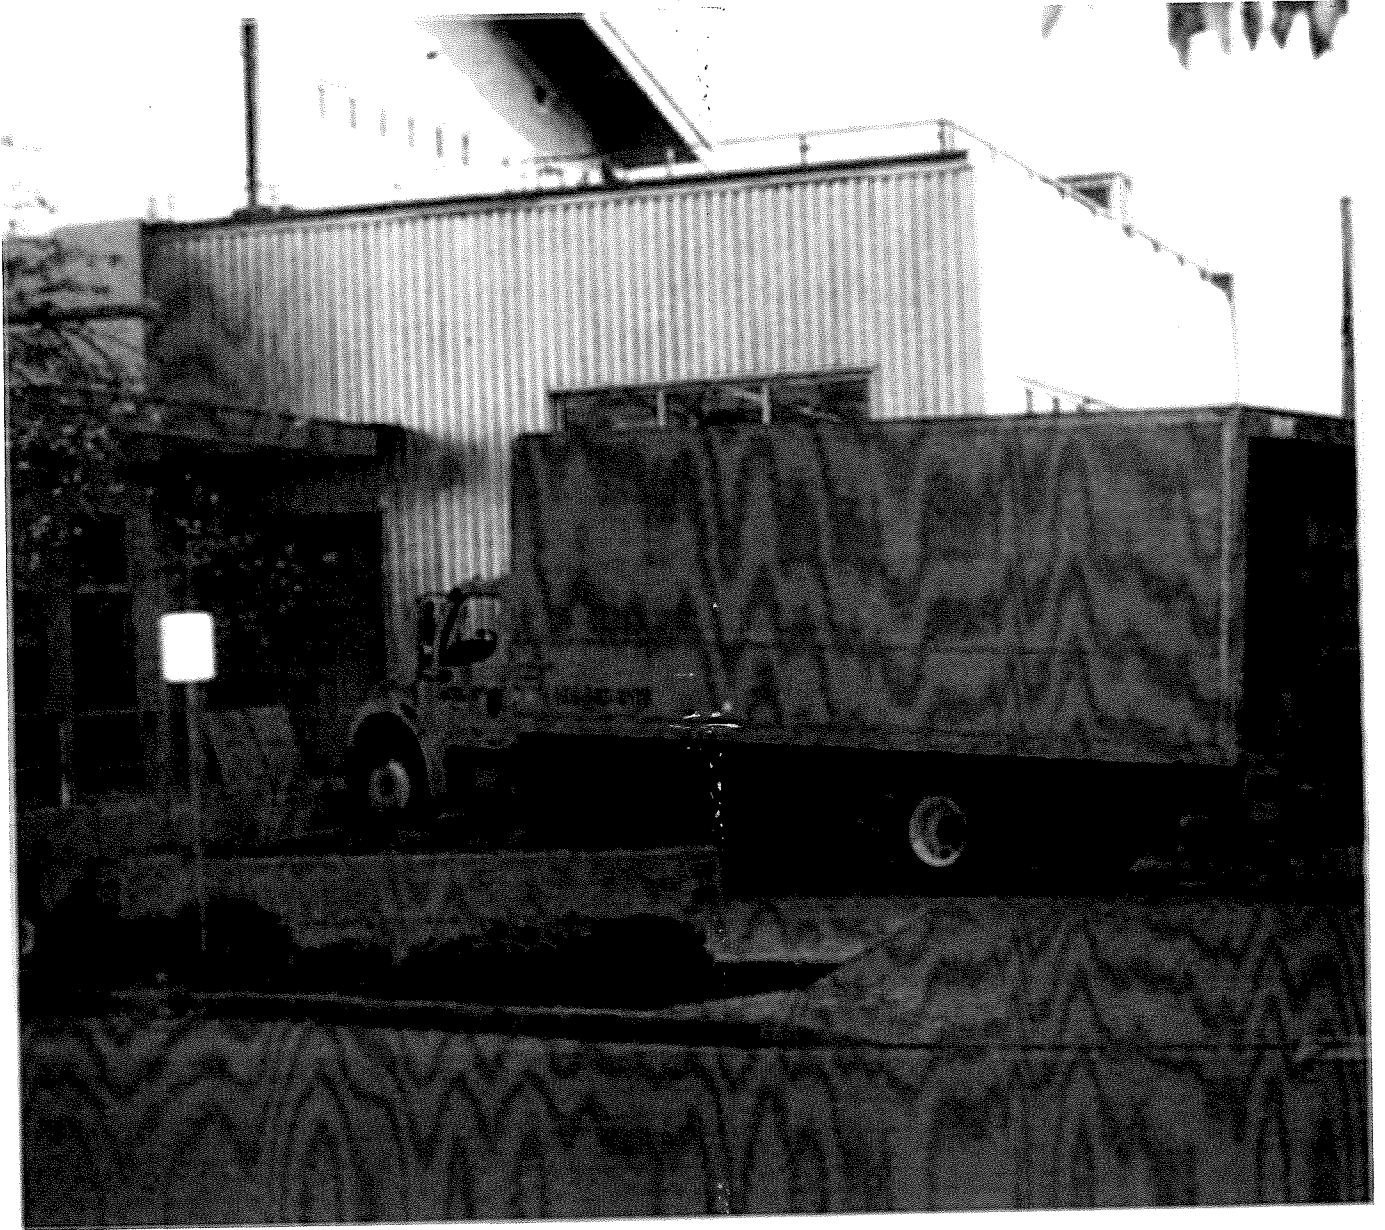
shows 4080 Bayview St where the daycare is located that was added to the existing zoning. The picture shows the loading dock installed by Onni in order to service the lower floor of the building where a grocery store is proposed. This loading dock faces west but is not useable because pup tractor trailers cannot back into it from Bayview. Any trailers approaching from No 1 road (as proposed by Onni) cannot back into the loading dock as the turn is too sharp when backing up. Even if they were able to make it they would block the whole entrance to the underground parking, and the sidewalk which creates a safety and emergency access problem. The picture also shows how busy Bayview can be with parents parking in the loading zone located across the street that belongs to Imperial Village
